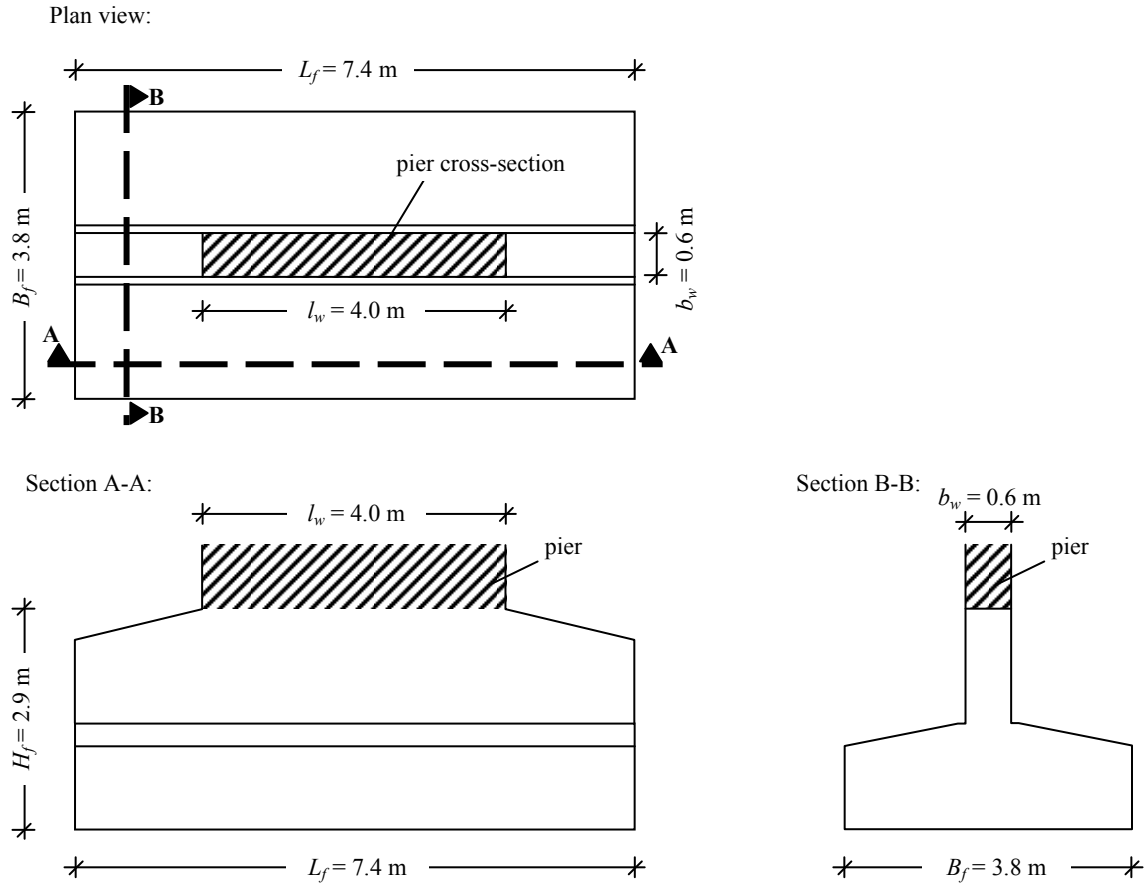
Geometry of spread foundation for piers 1 and 5 of sample bridge Viadukt Mühle Rickenbach (SG)
